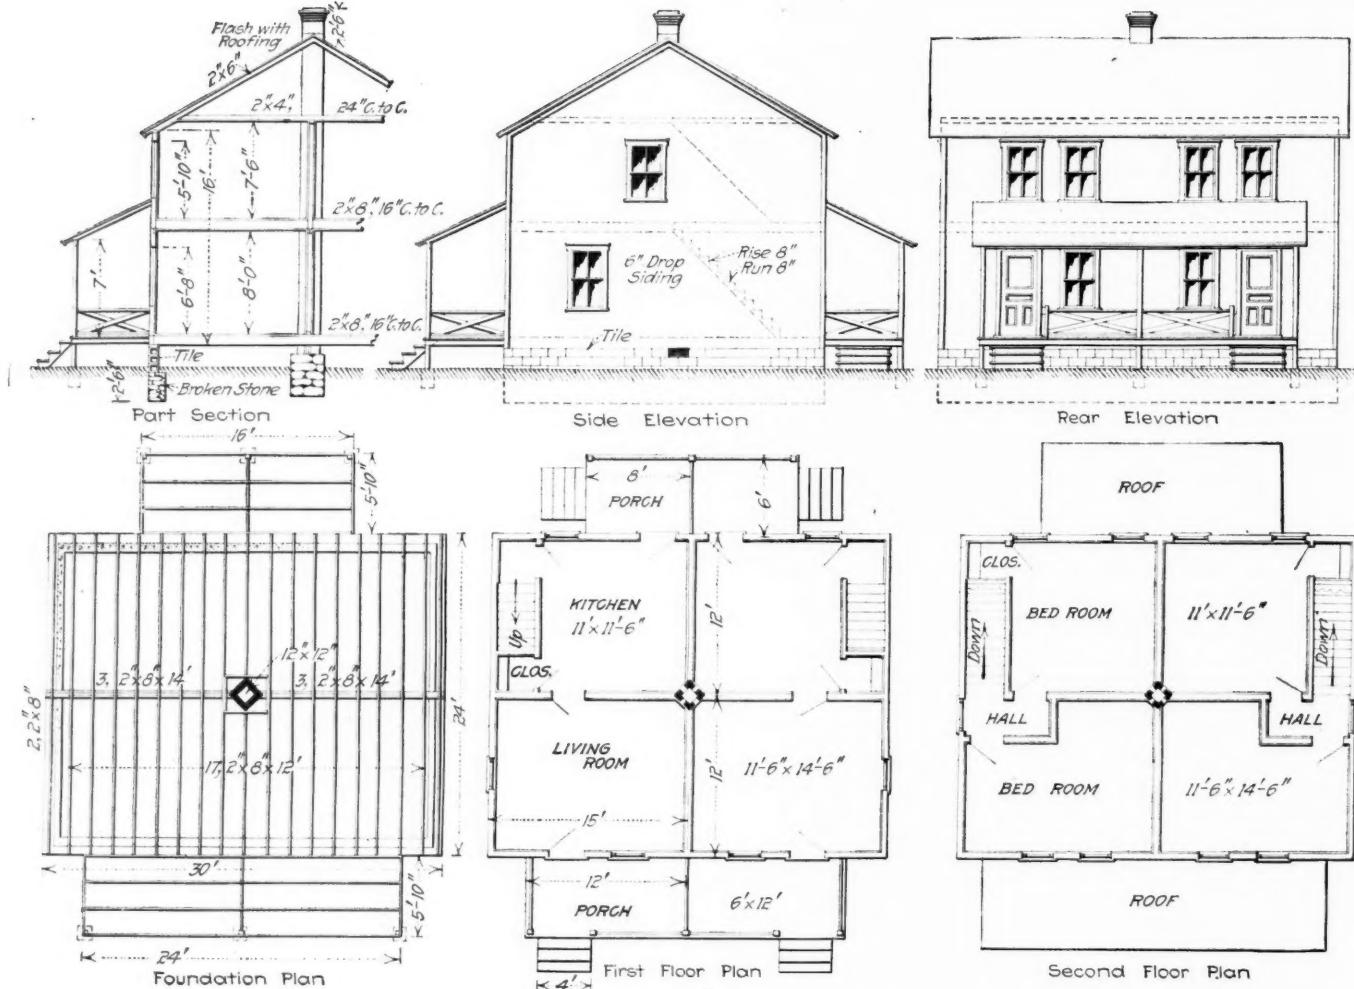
DETAILED DRAWING OF DOUBLE HOUSES BUILT AT COAL RUN, PENN.
